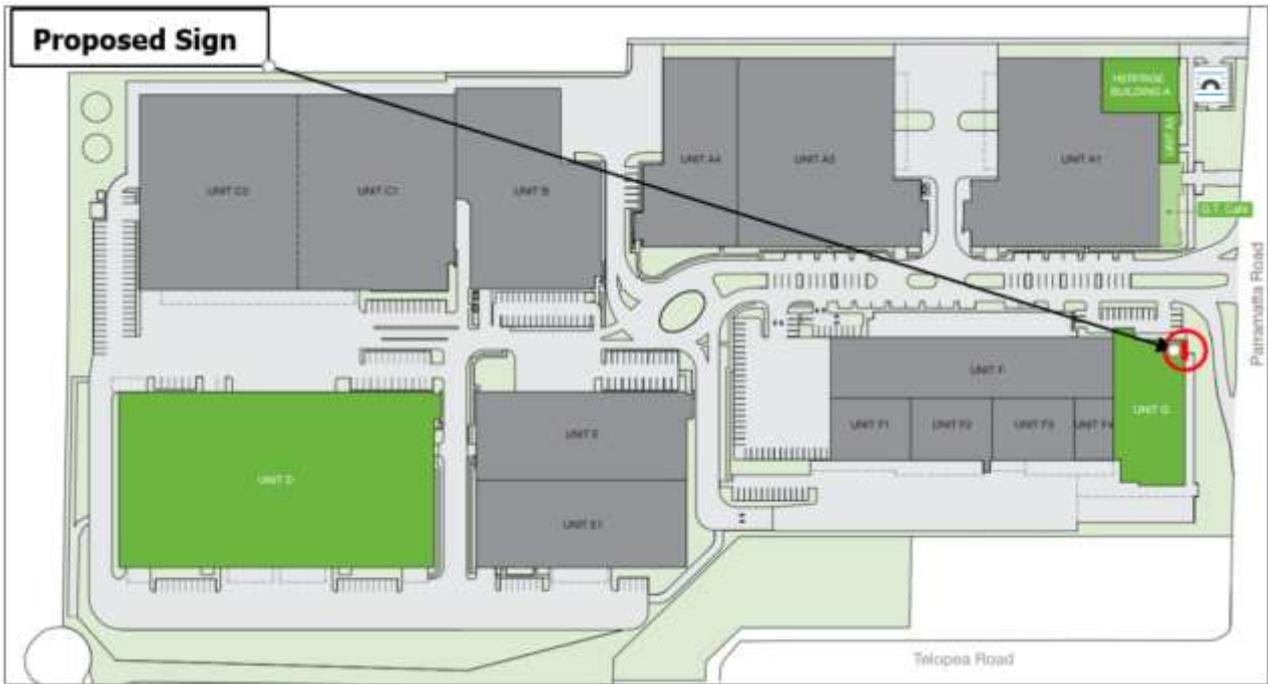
Extract of the site plan showing the location of the proposed sign (identified in red)
